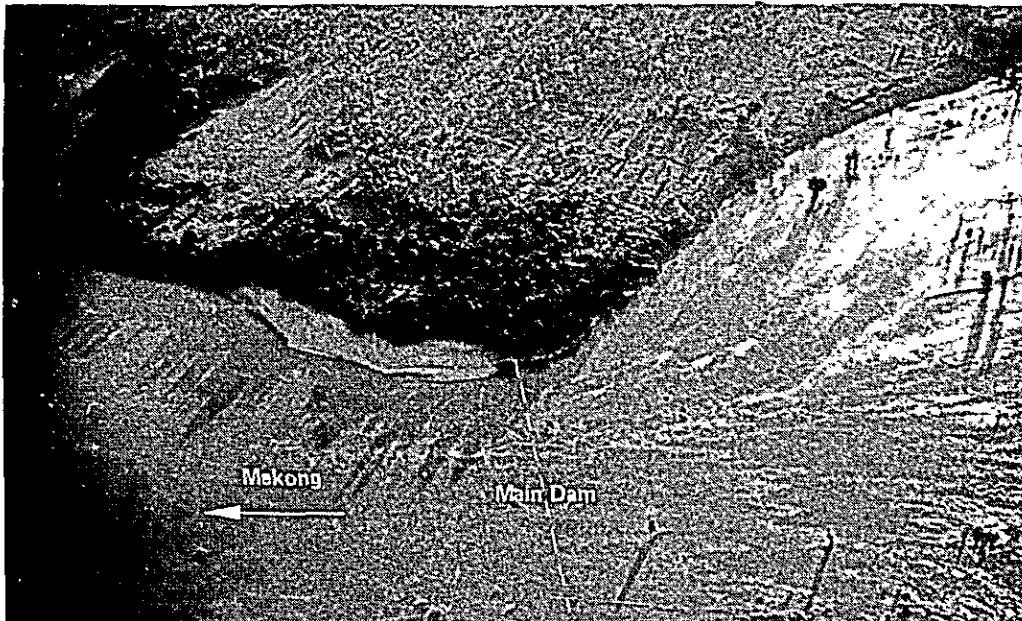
Right Bank of Sambor Dam Site (December 1964)
